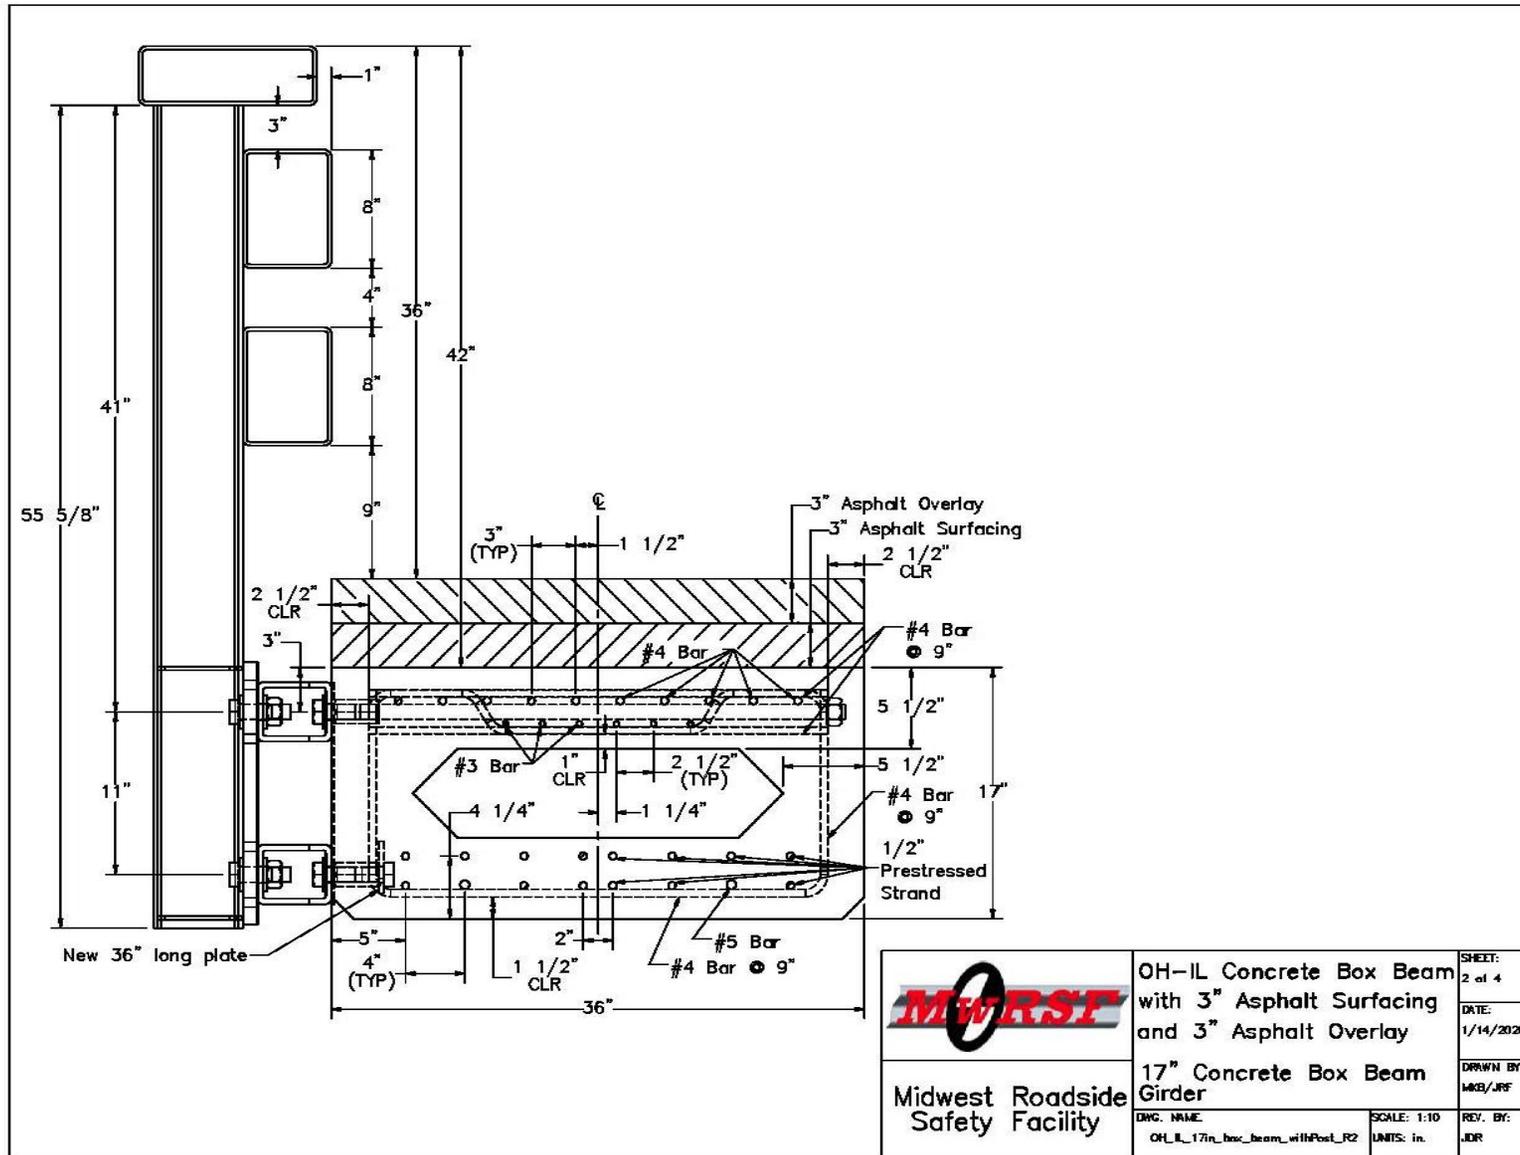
Typical 17-in. (432-mm) Deep Concrete Box-Beam Girder with Asphalt Wearing Surface and Future Overlay
